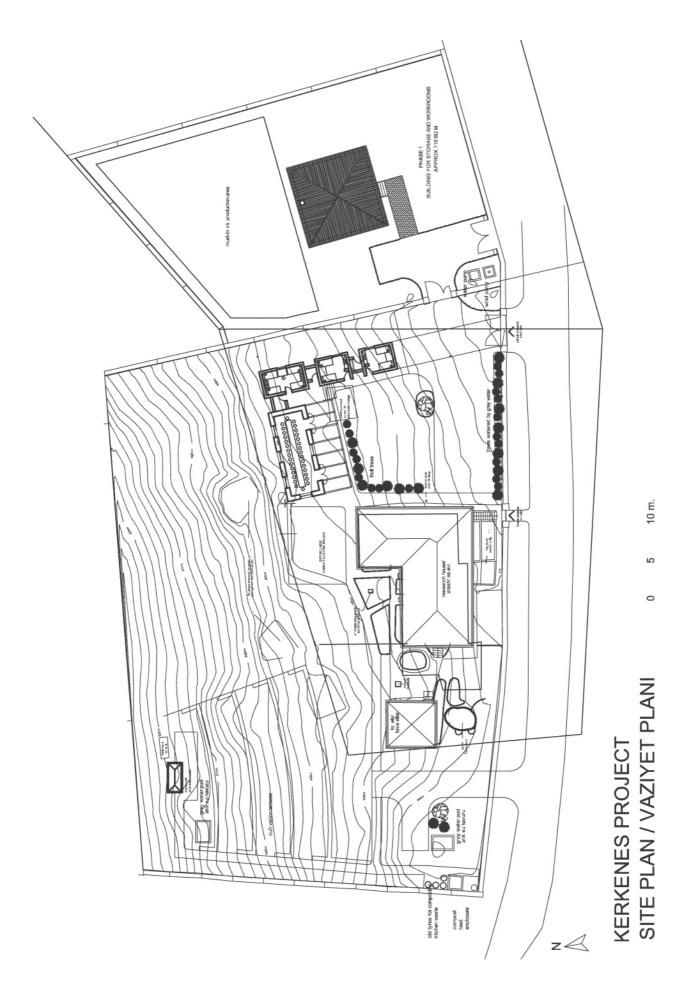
Site plan showing preliminary proposals for the Kerkenes Eco-Center activities.
